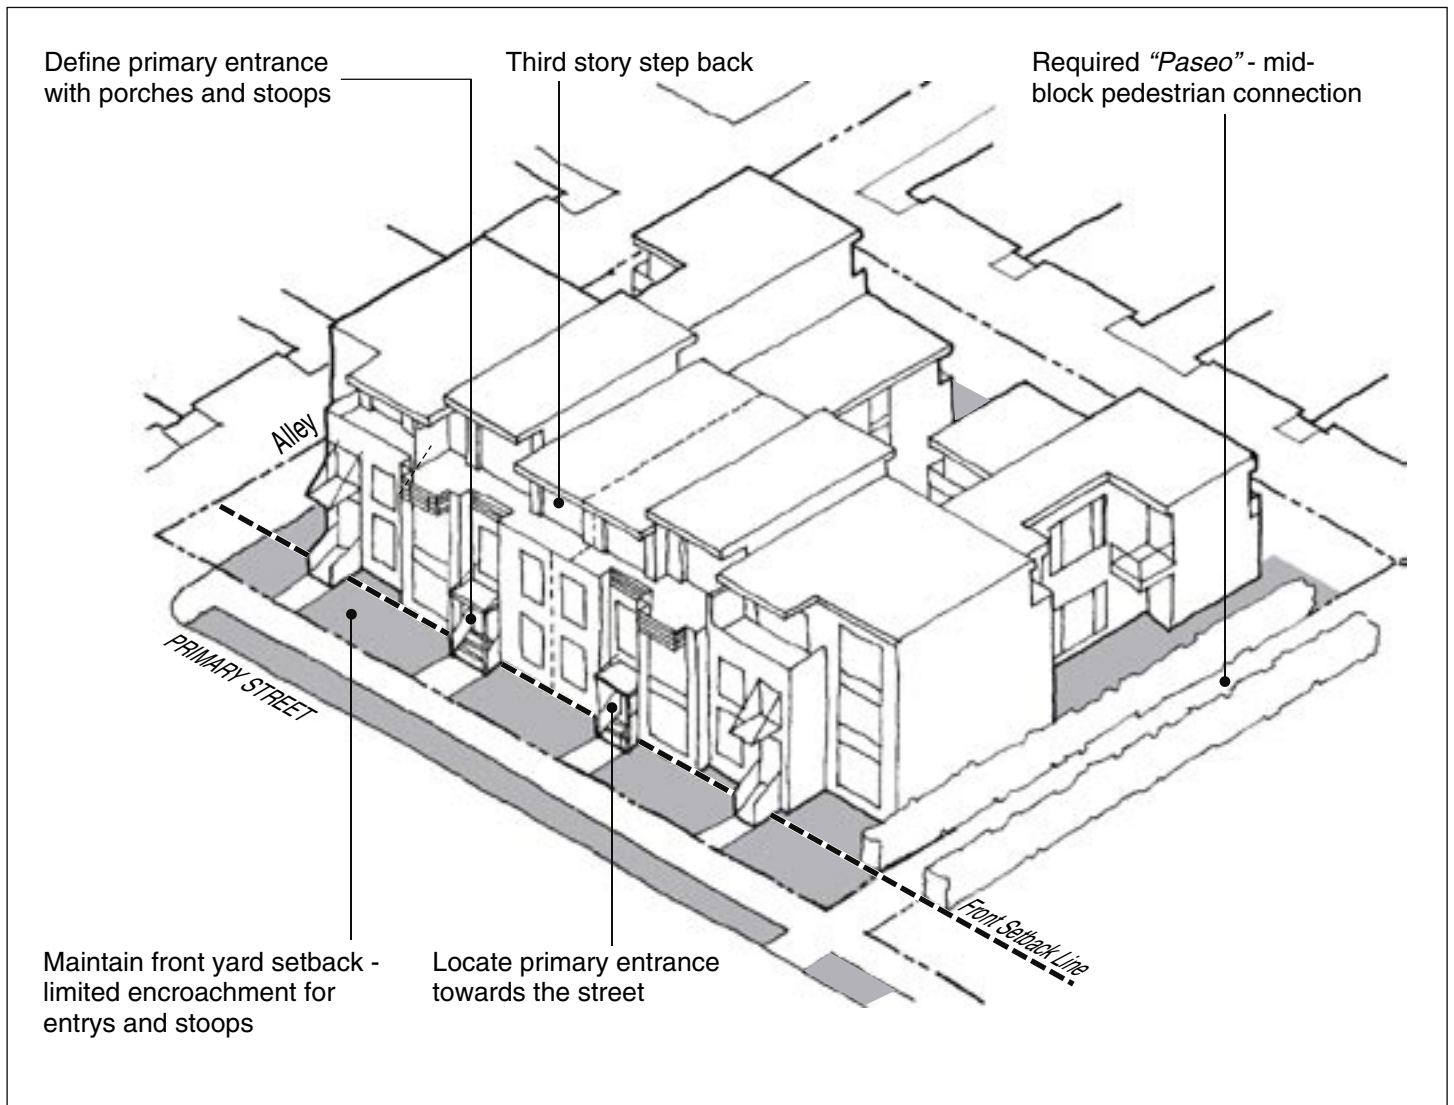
Row House District - Building Orientation and Frontage Conditions
